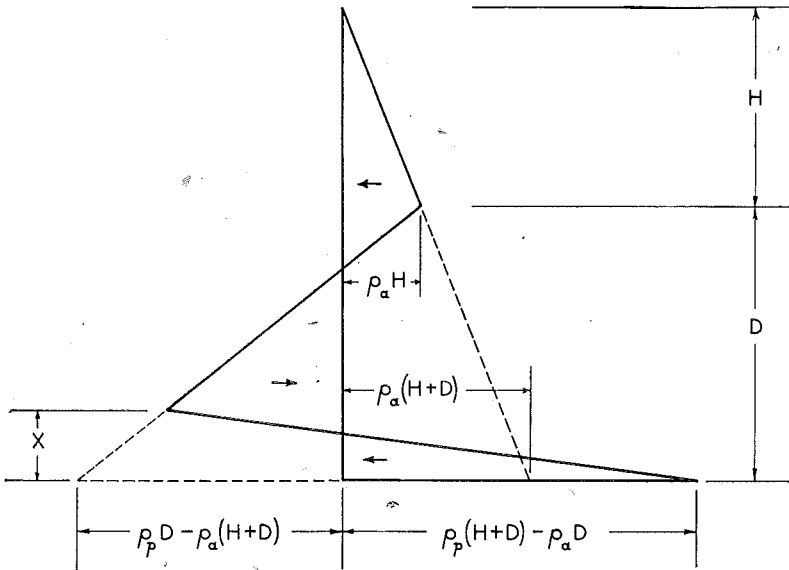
CANTILEVER SHEET RETAINING WALLS.
